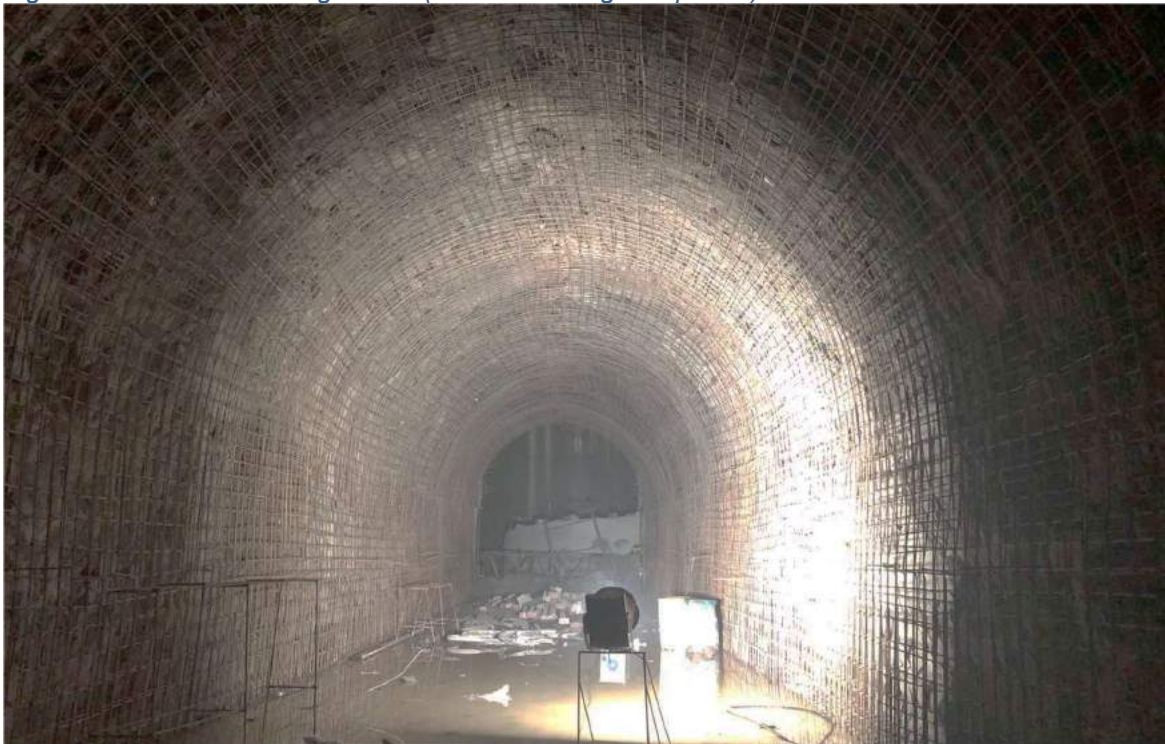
Rebar layout at surge shaft for full lining concrete
